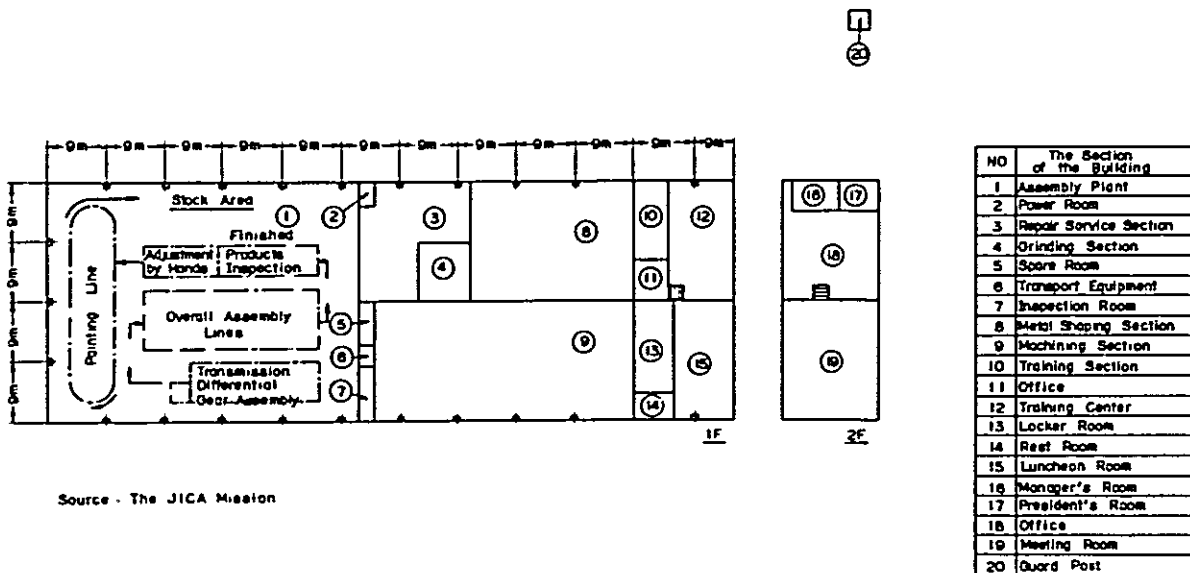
shows the proposed plant layout when the expected market is limited to El Salvador only, while Figure IV-2-14 shows the proposed plant layout when CACM is the expected market.
